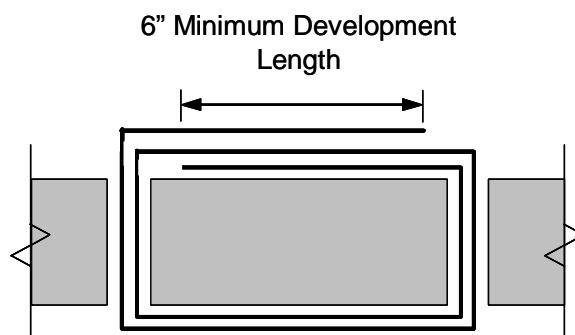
Connection Upgrade A4 CFRP Shear Stirrup Detail
